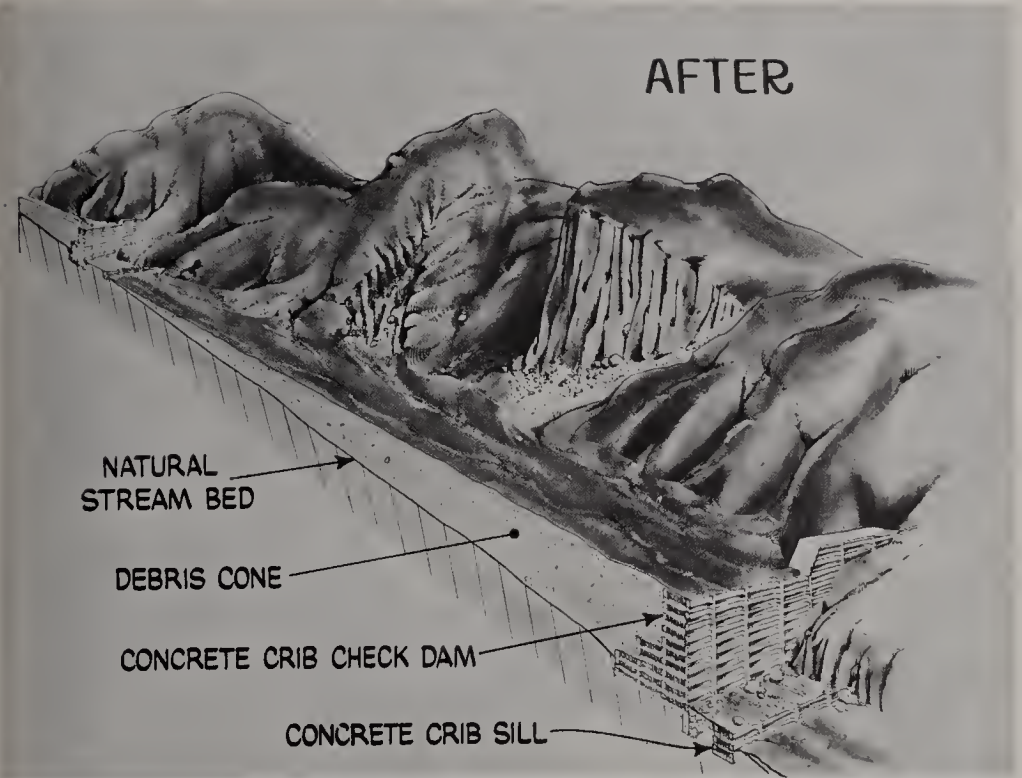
Concrete crib check dam installed in a mountain stream channel for stabilizing stream beds and sides as well as trapping debris.
